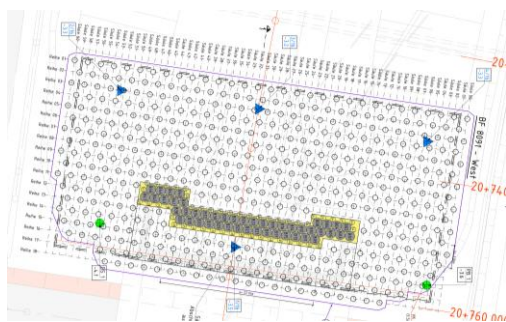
Site plan of GEC columns and shield structure, Bridge BW 8091-West, modified from Ed. Züblin AG
